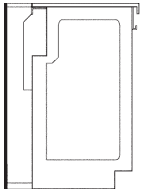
Floor Level Outdoor Air Intake with Window Below Unit Top Using Arrangement AL and 9" "Finished" (Painted) Accessory (Uninsulated) Closed Pipe Tunnel
